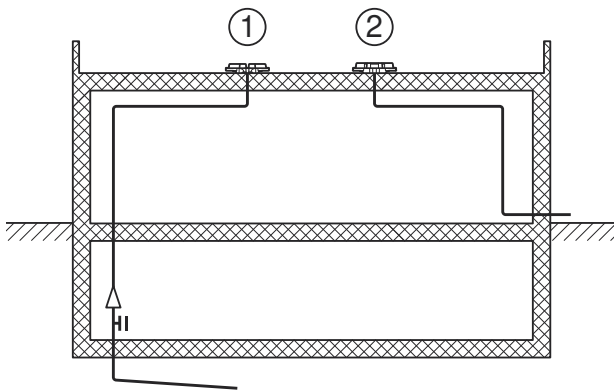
Geberit Pluvia emergency overflow system as a separate drainage system
